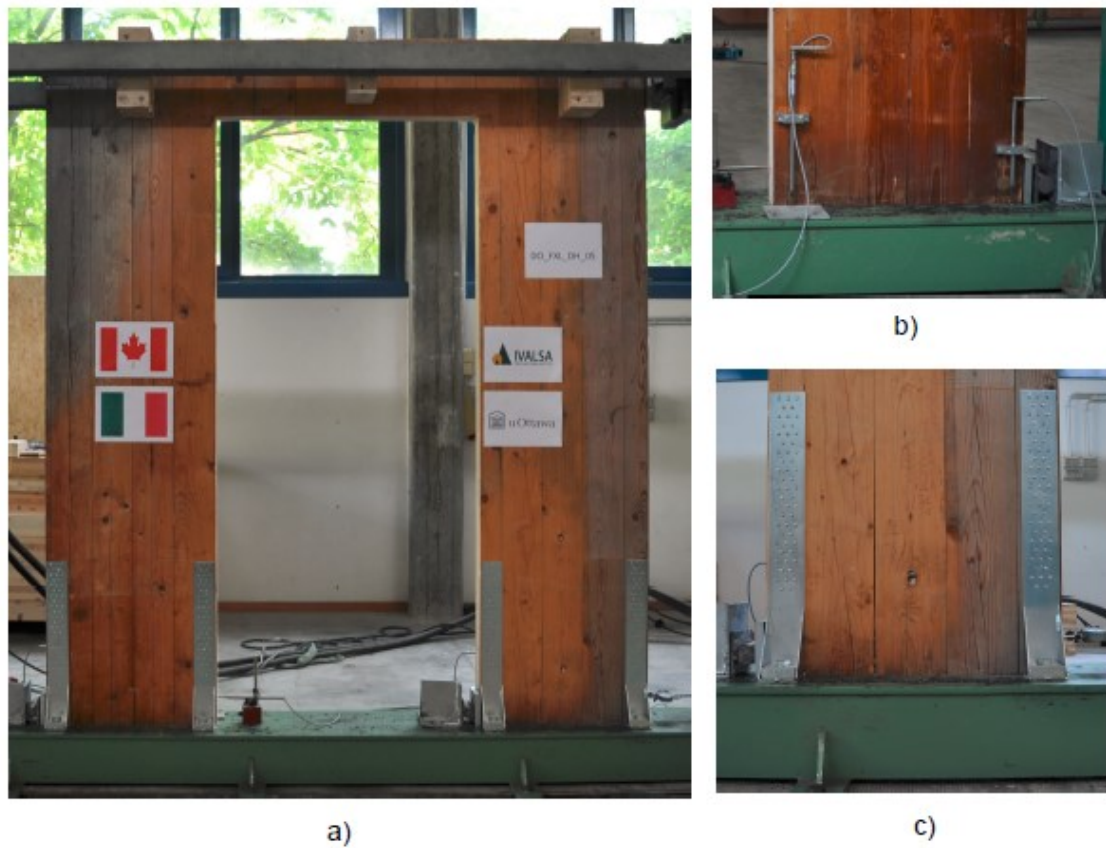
Geometric configuration, connection system and monitored displacements of shearwall 04, a) picture of the wall, b) LVDTs placed at the left wall segment and, c) zoom in of WHT620 hold-down connection at the left wall segment
